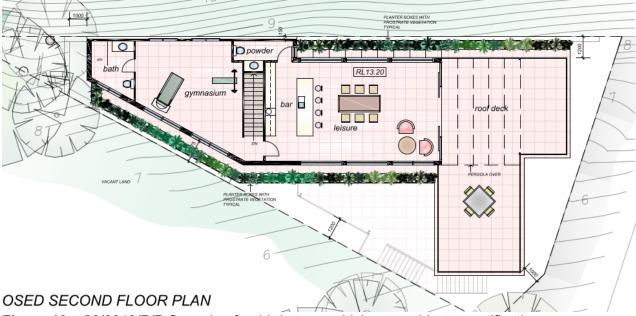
23/2013/P/D floor plan for third storey which was subject to notification
